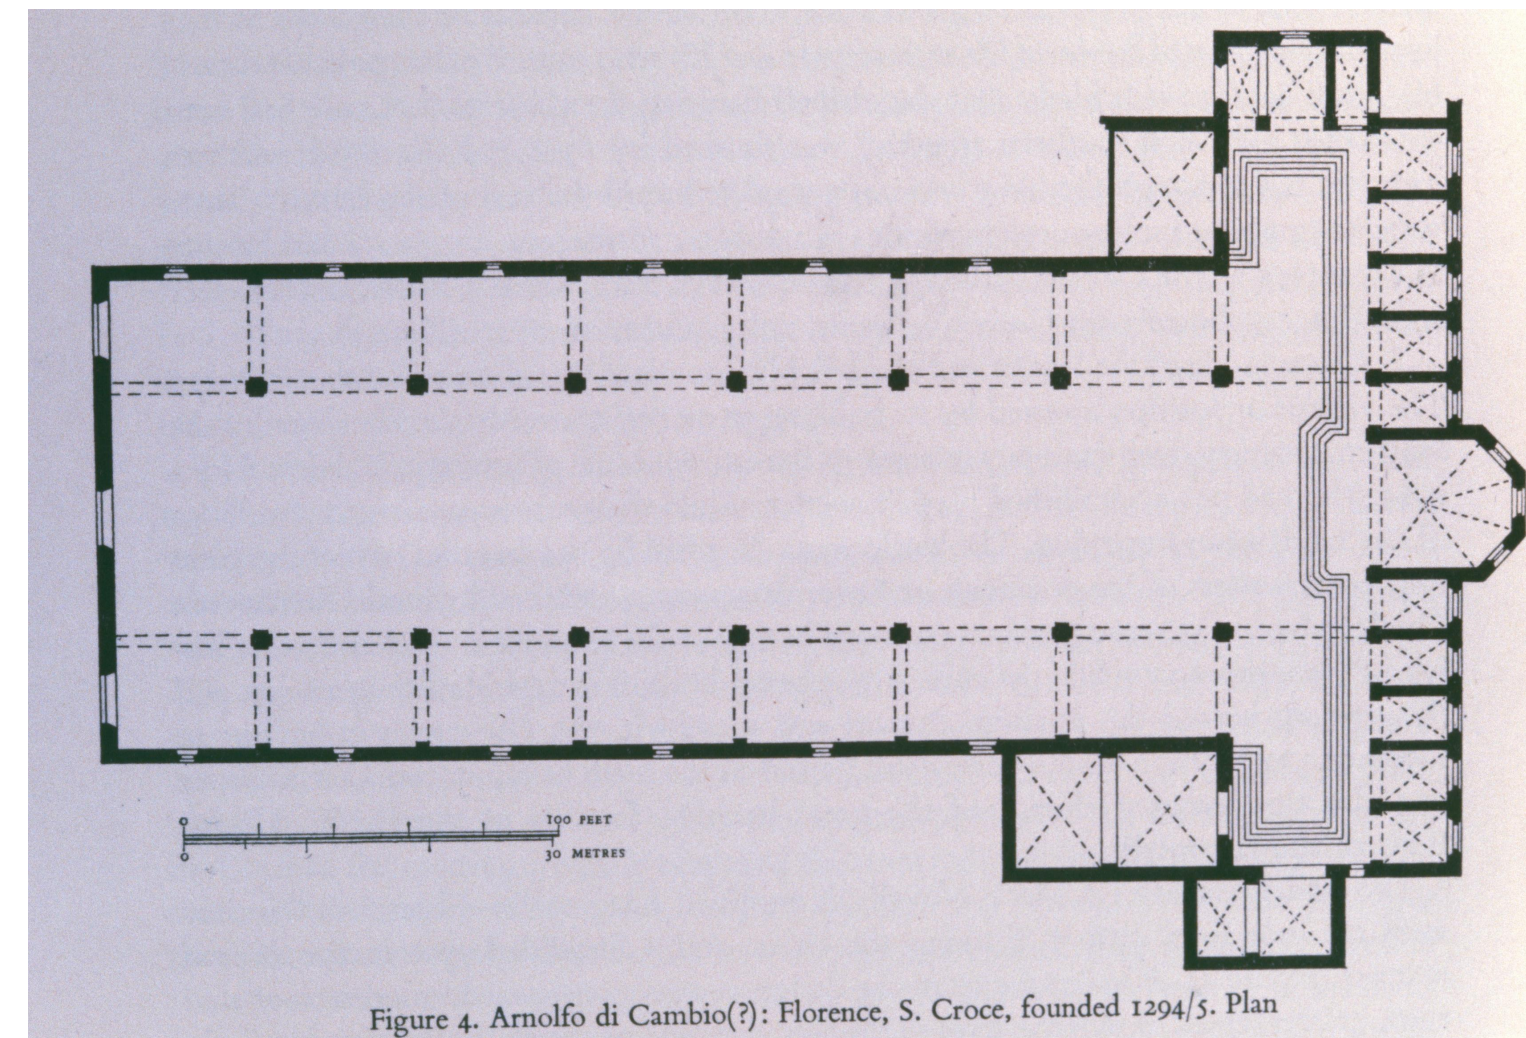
(O\_Pi\_2) Plan of Church of Santa Croce, Florence
